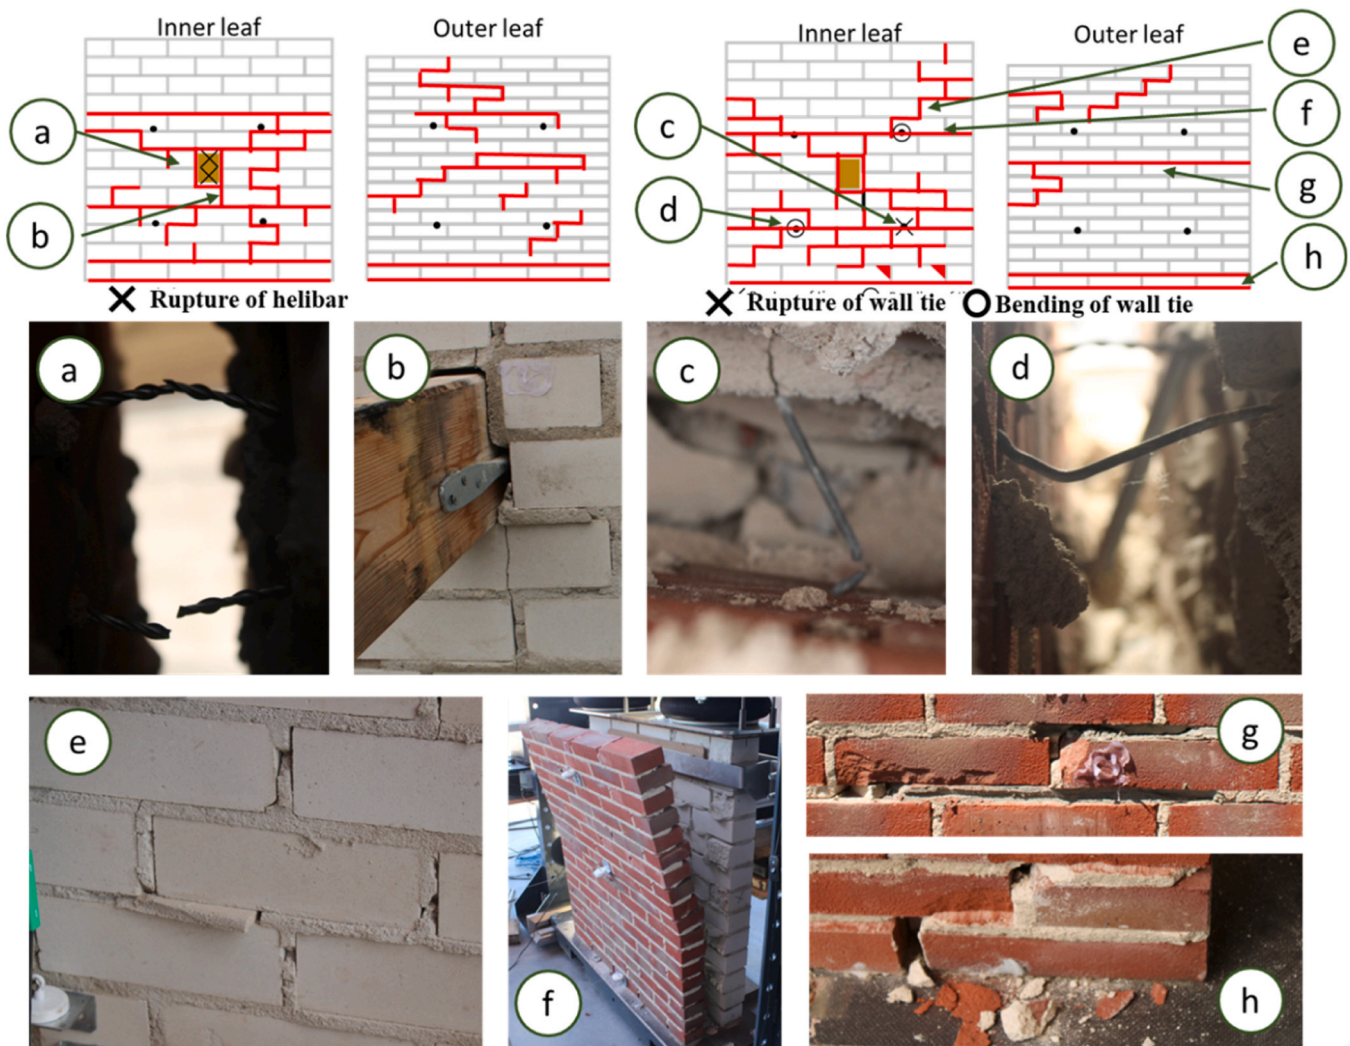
Observed damage at the end of test Specimen TJ6 and TJ4: Rupture of the helibars (a), sliding of the joist and brick cracking at the location of the hook anchor (b), rupture of the cavity wall tie (c), bending of the wall tie (d), cracks around the embedded wall tie as well as the expulsion of the cone of mortar around the tie (e); OOP rocking mechanism of the outer leaf (f), concentration of damage in the outer leaf due to the helical bars (g), and sliding cracks at the base of the outer leaf (h).
